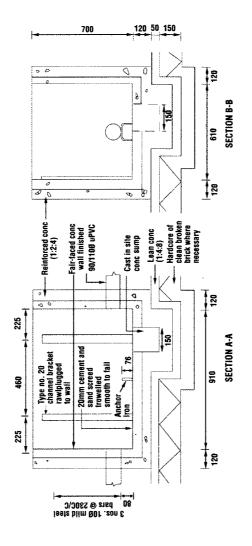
MANHOLE DRAWINGS - TYPE JX2
